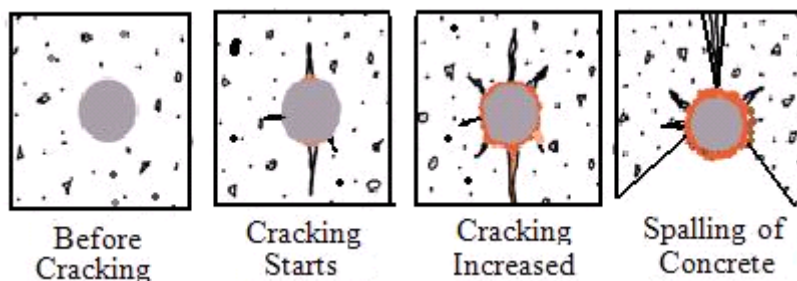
The corrosion of steel bar starts causing the expansion steel bar and cracking in concrete. As the times passes, the more extensive cracking leads to spalling of concrete. Adapted from Domone & Illston (2010)
